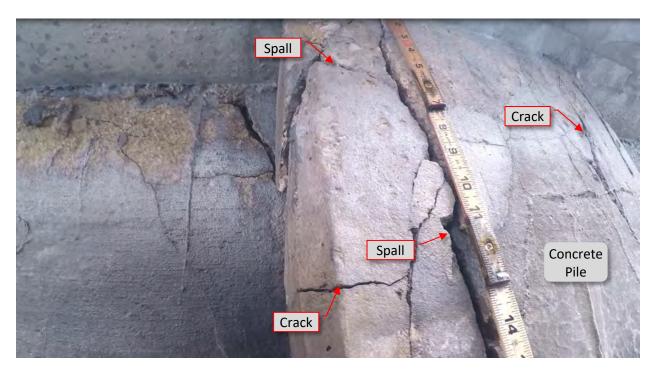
P36. STA 5+48. Cracks/spalls at both flanges at pile and loss of concrete. View of west flange.
